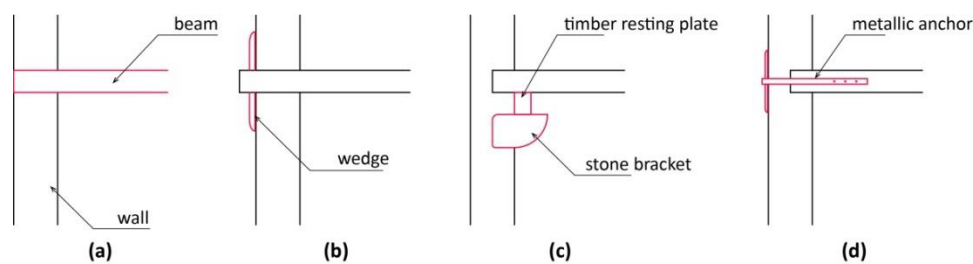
Different types of reinforced beam-to-wall connections: (a) timber beam resting on the whole width of the wall; (b) timber wedges; (c) timber resting plates and stone brackets; and (d) metallic anchoring devices (Ortega et al. 2017)
